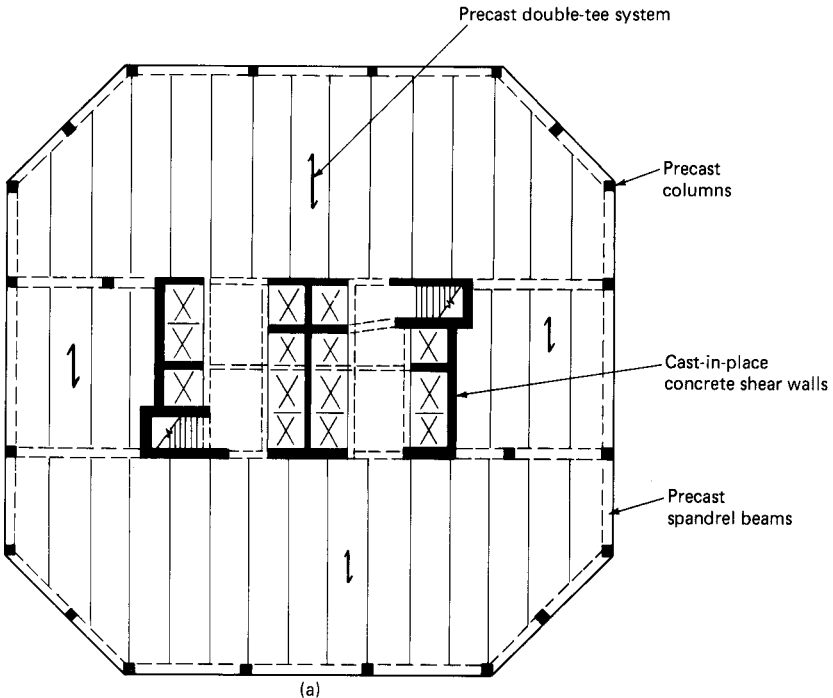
Examples of shear core buildings. (a) Cast-in-place shear walls with precast surround.
